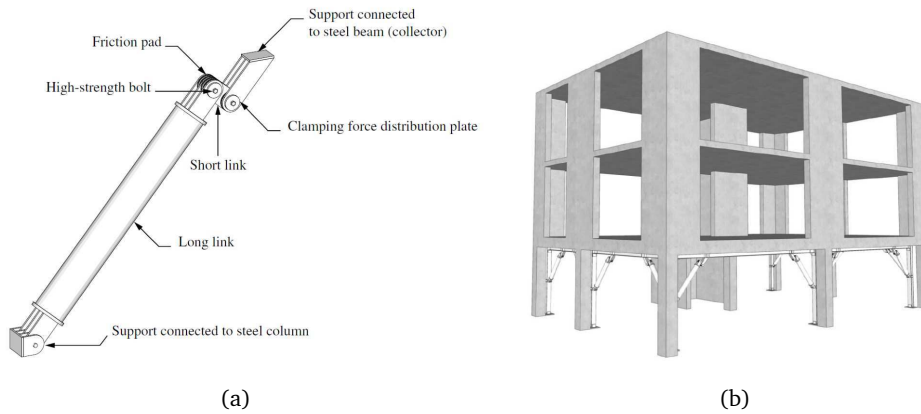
Dissipative connections for soft-first-storey structures presented by Javidan and Kim (2019): (a) device detail and (b) frame installation.
